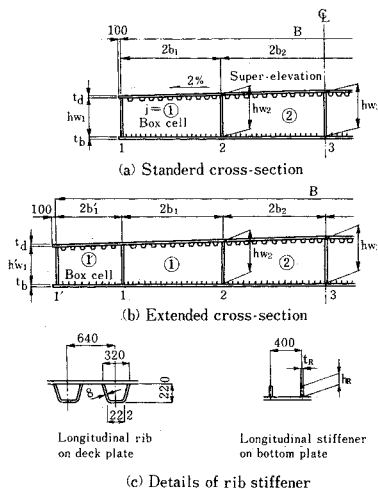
General Cross-Section of Main Girder in Aji River Bridge.
